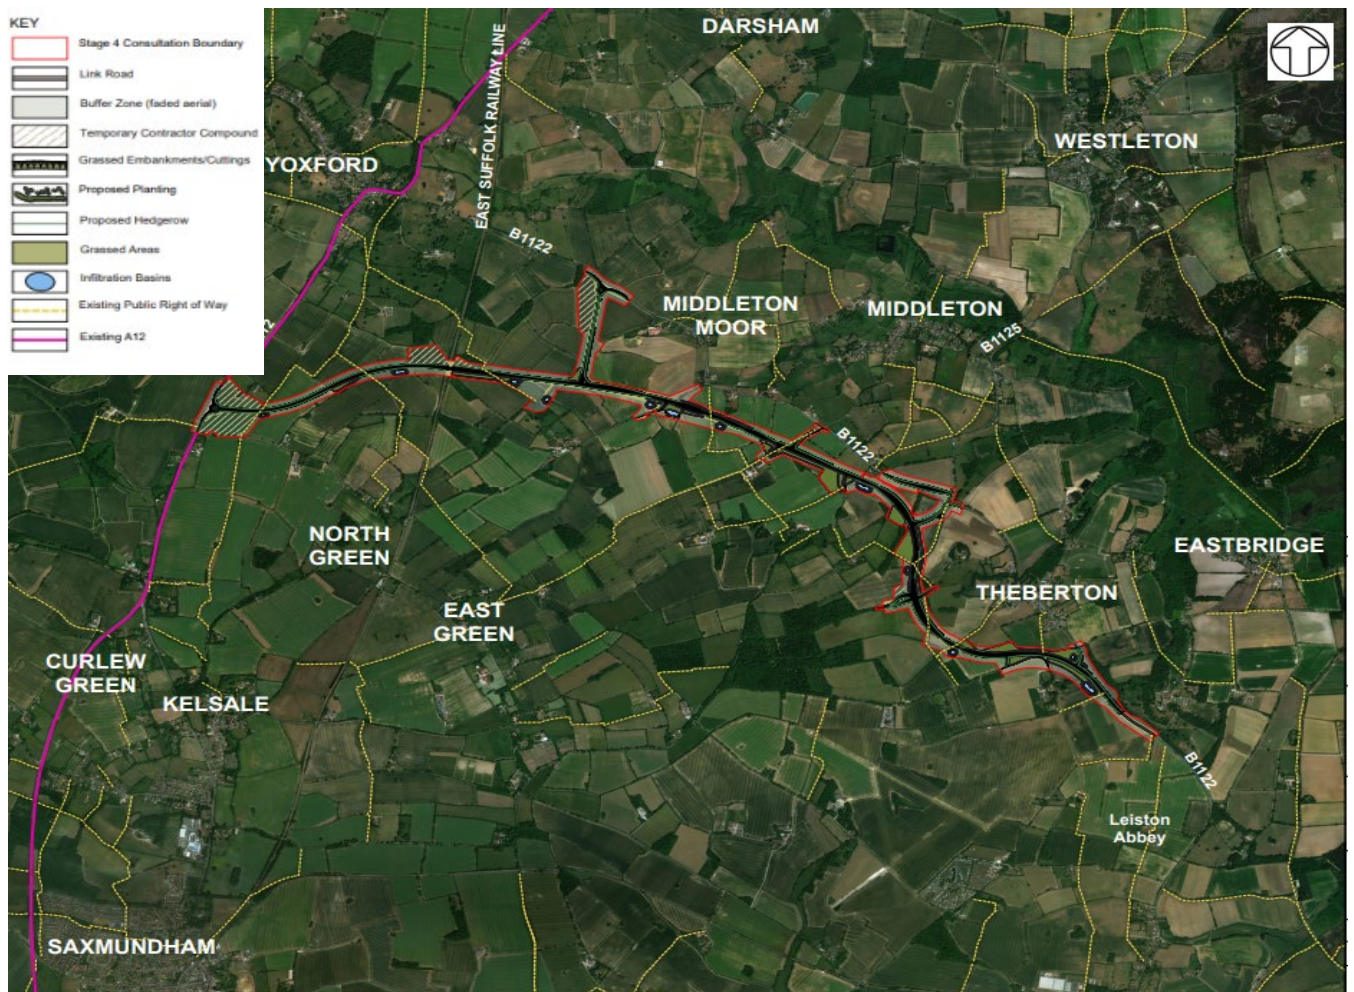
Stage 4: Indicative Sizewell link road masterplan Area 1
